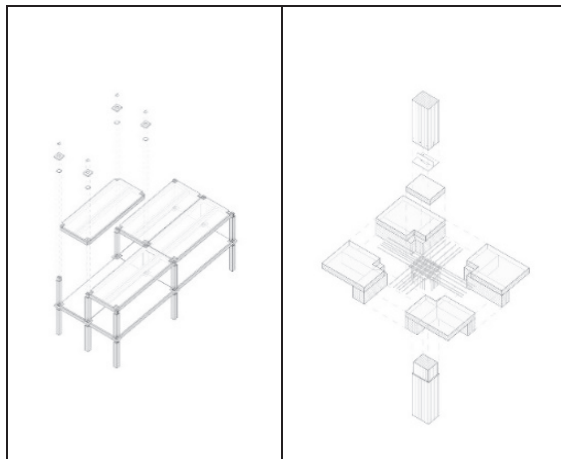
Floor system and column to floor detail of zWatt H1 building [4]
